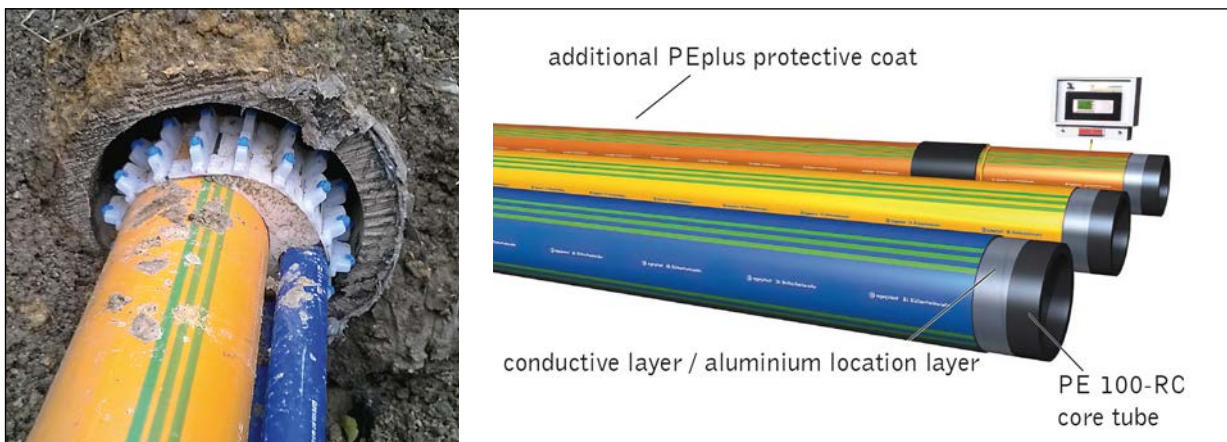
Biogas pipeline connecting the sewage treatment plant with the Tychy Water Park
